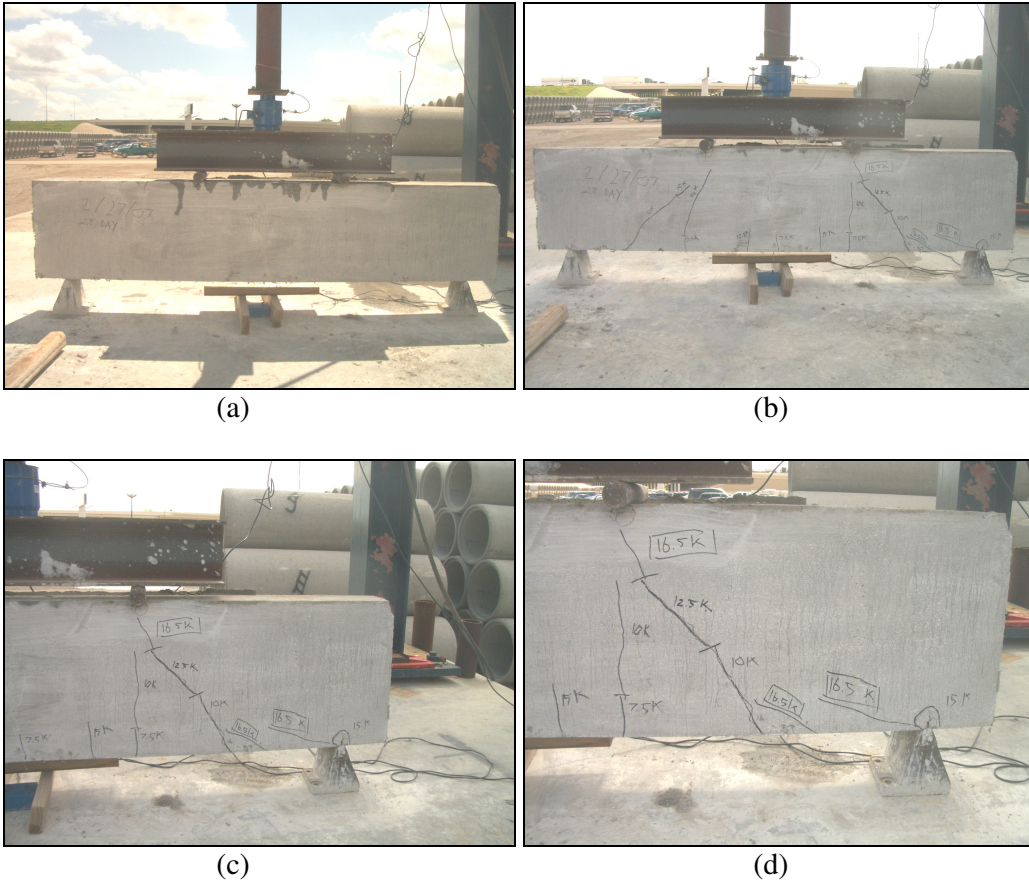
Ductile lightweight concrete beam with reinforcement cast on 2/27/07 for 28 day test; (a) before test, (b), (c), and (d) cracks on the beam after test
